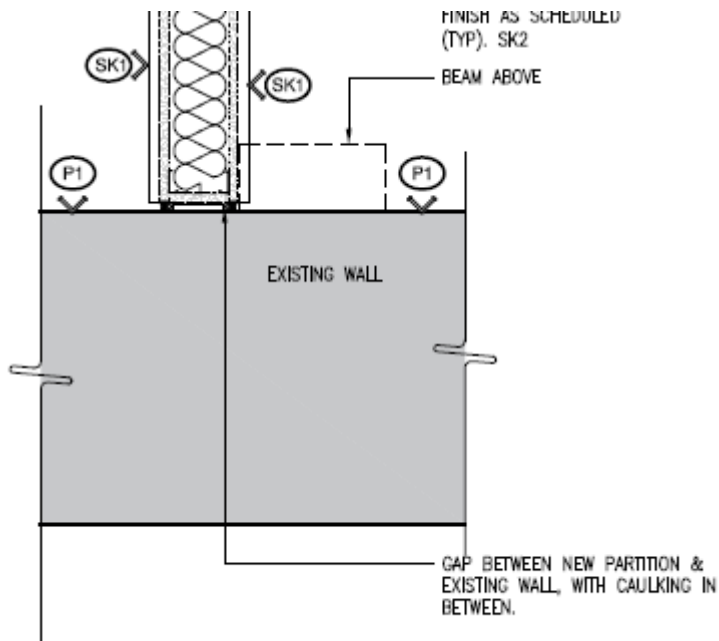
Detail of the proposed connection of the furniture store wall (first floor) relative to the stone bracket and truss; Plan Detail P03
